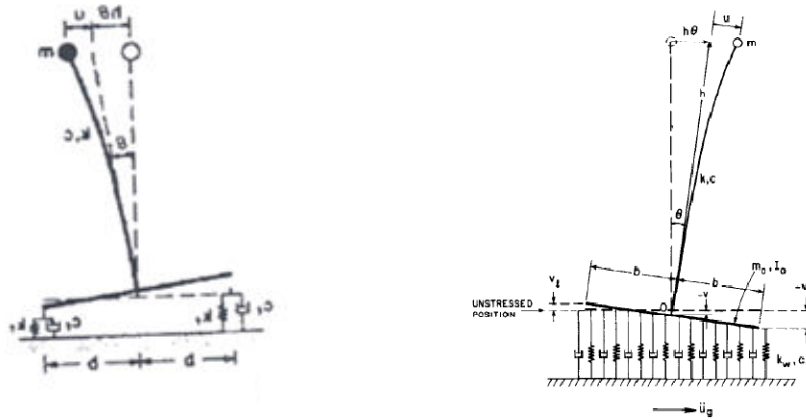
Flexible Structure supported on (a) a simple two-spring viscously damped foundation and (b) on a winkler type foundation (after Yim and Chopra (1984) and Chopra and Yim, 1985)
